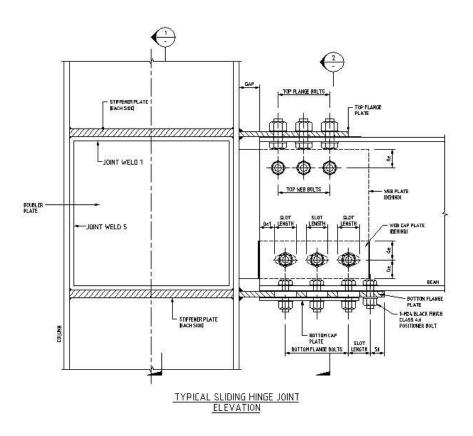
MRSF Beam Column Joint - Sliding Hinge Arrangement
